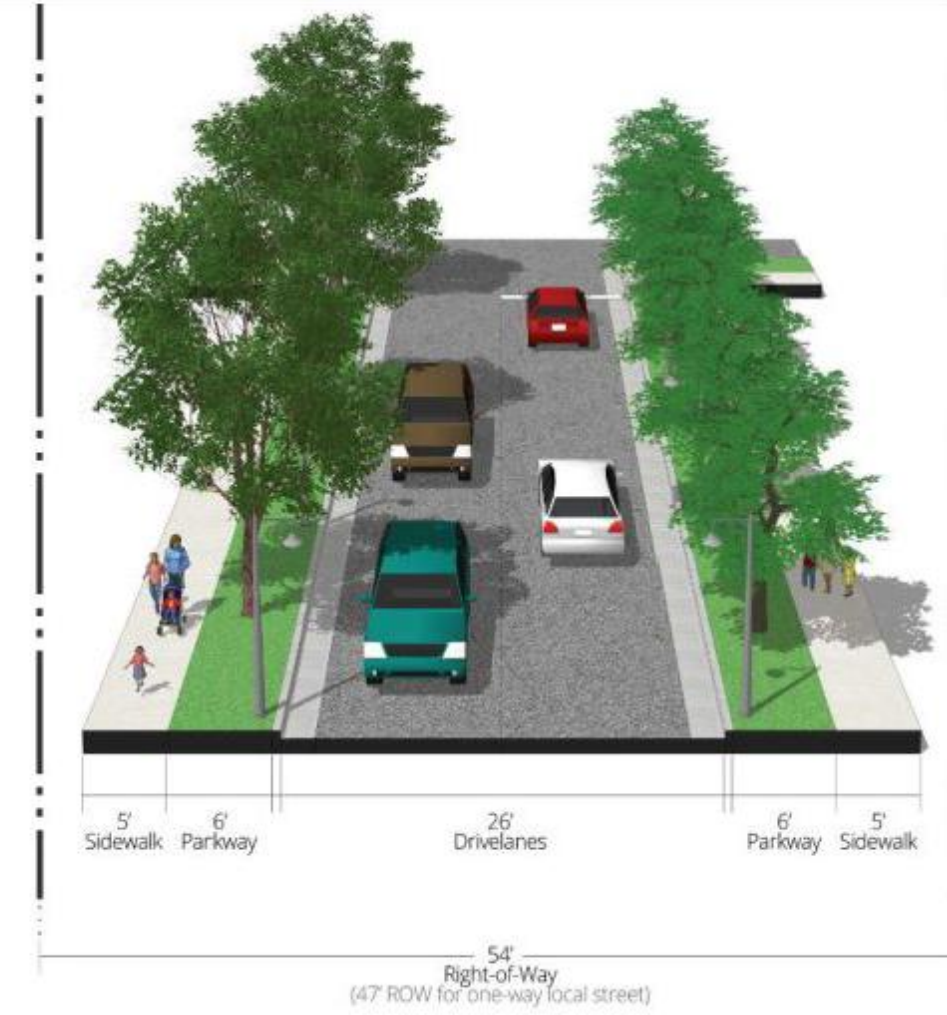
Urban Avenue Cross Section Standards - Version 2
